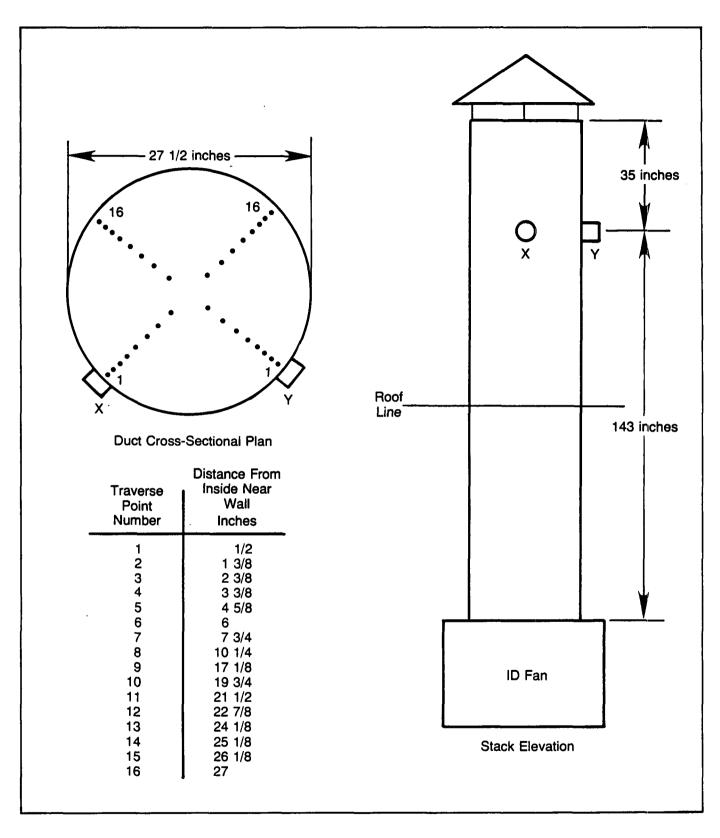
Rock Dryer Baghouse Outlet Stack Port and Sampling Point Locations
